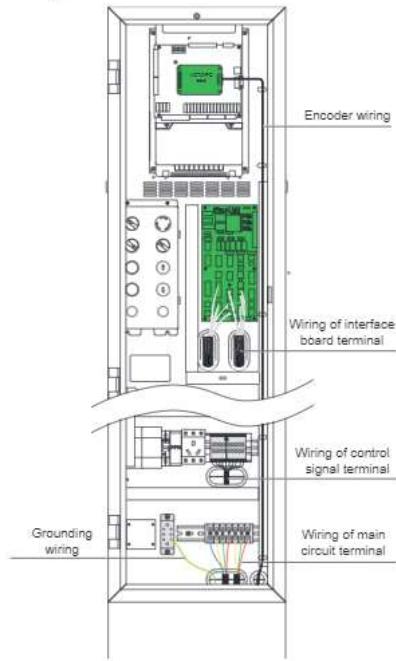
Wiring of external interfaces of machine-roomless control cabinet
